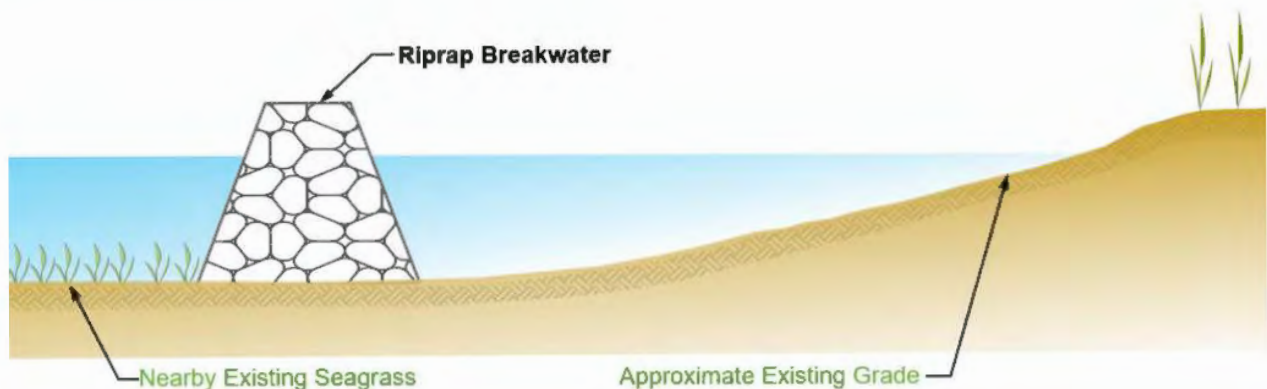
Conceptual section view of Alternative 1: riprap breakwater
